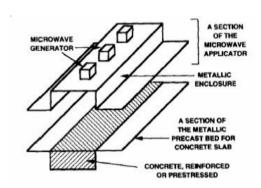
A plausible microwave applicator for precast concrete slab (Leung and Pheeraphan, 1995).
